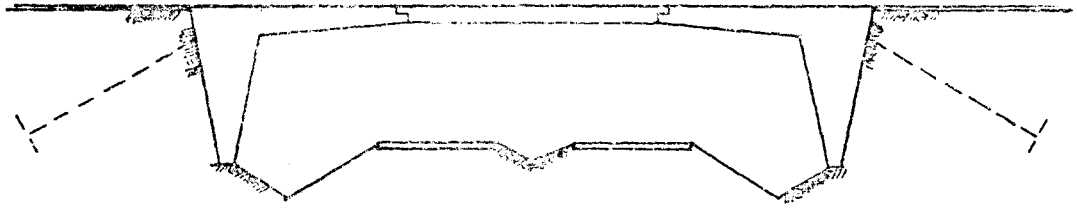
DOUBLE CANTILEVER WITH SUSPENDED SPAN BRIDGE CONCEPT
